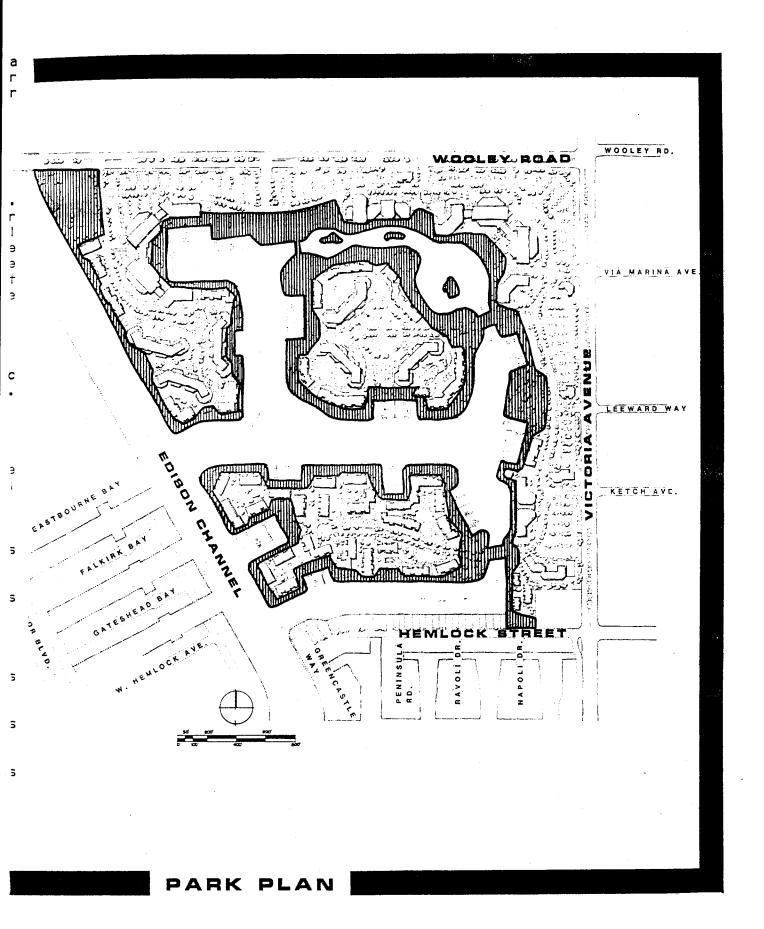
A-4-OXN-03-014 MSBP PARK PLAN
